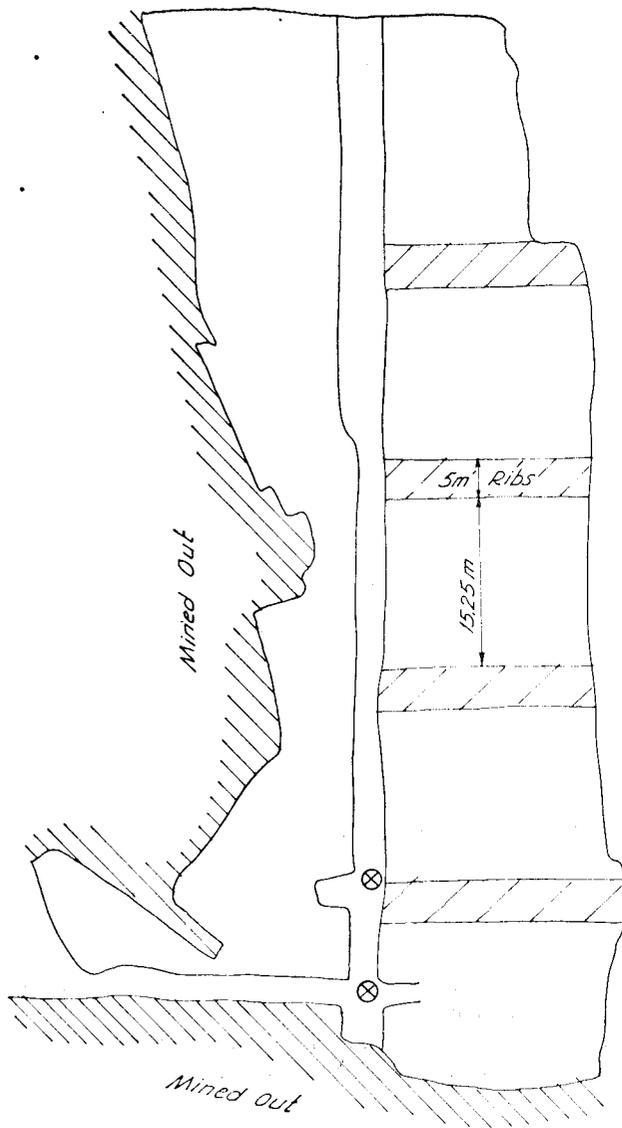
Layout of typical footwall ribs to facilitate the stoping of footwall bands
